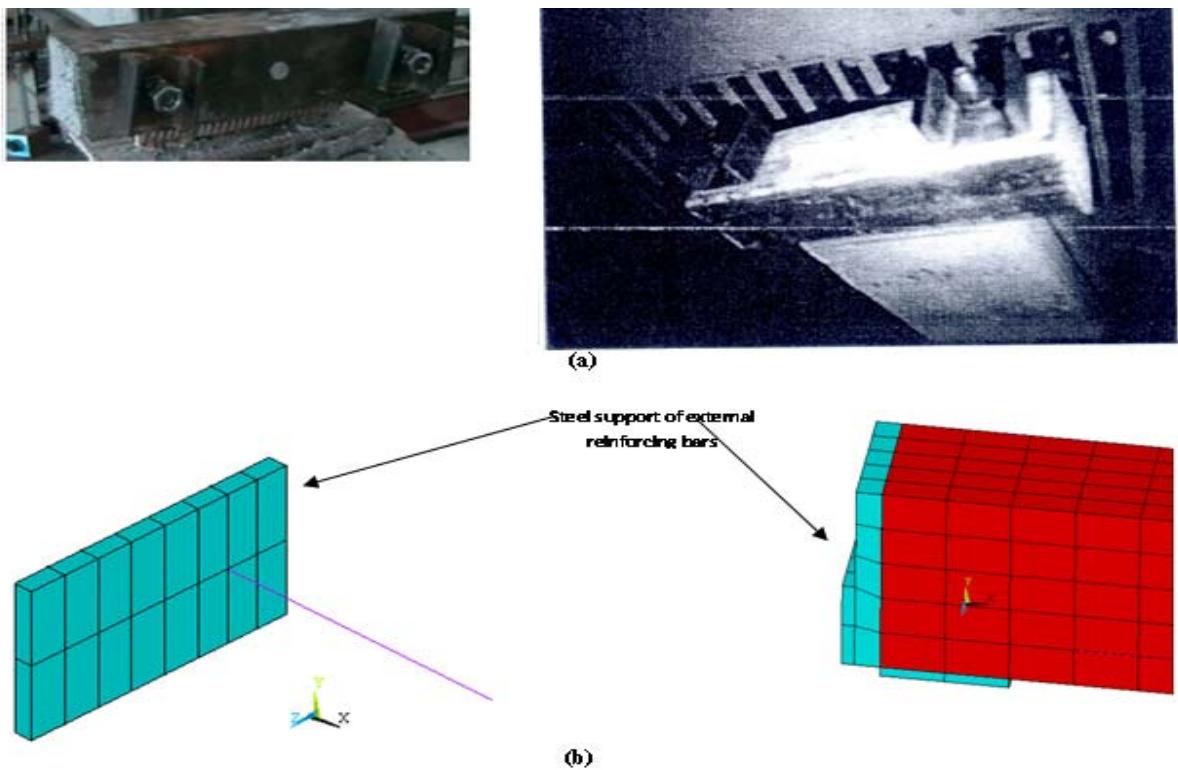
Details of steel support of external reinforcing bar; (a) in test beam; (b) in the model
